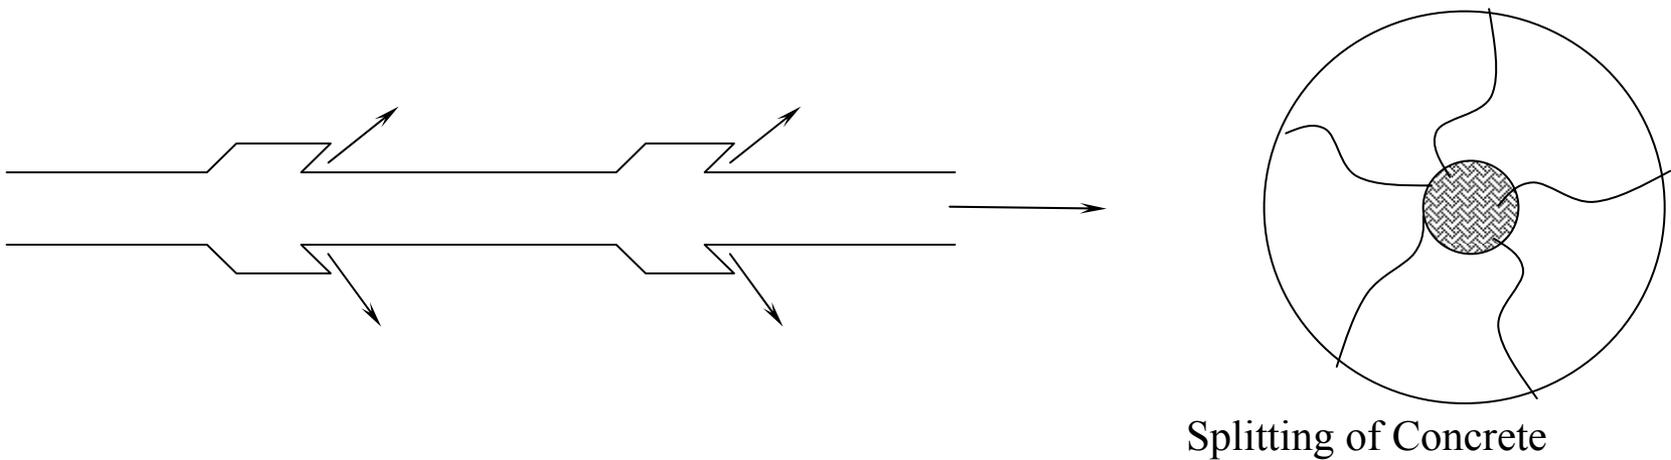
Cracking in Concrete Due to Pull in Steel Bar.
